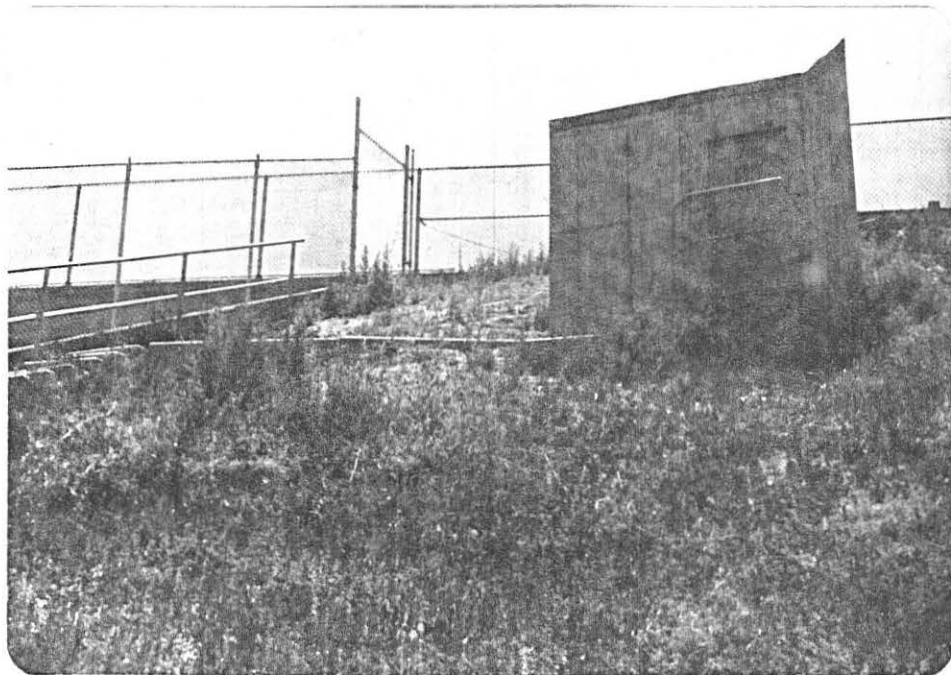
Exterior of Fabridam control tower with security fencing in background.
